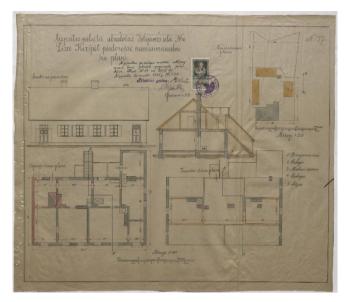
Plan and facade drawing of the household building. 1926 Archive material of the Aizpute Local History Museum.
